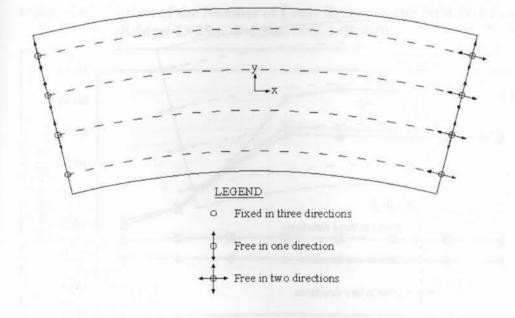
Bridge Bearing Support Arrangement Type TA
